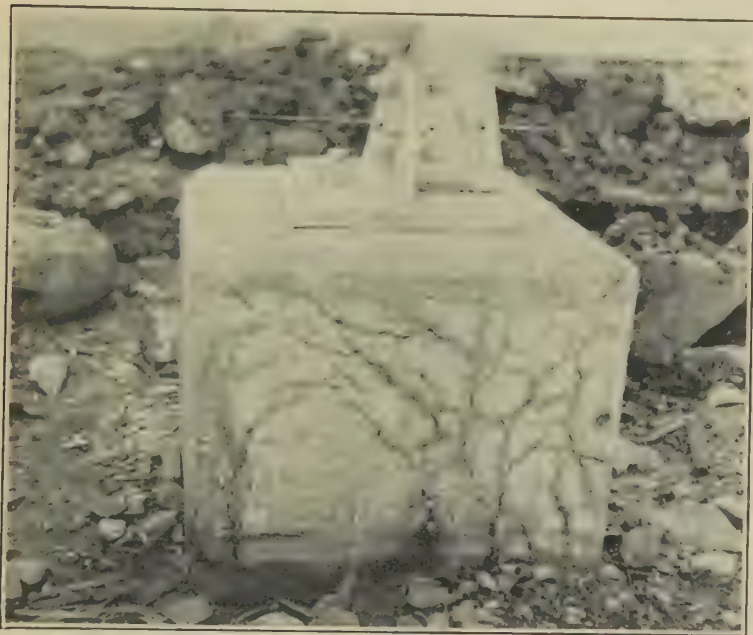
A PIER BUILT IN THE FALL THAT WAS NOT ACTUALLY FROZEN BUT WAS NOT PROPERLY CURED AND WAS DAMAGED BY FROST WHEN SATURATED WITH MOISTURE THE FOLLOWING SPRING.
